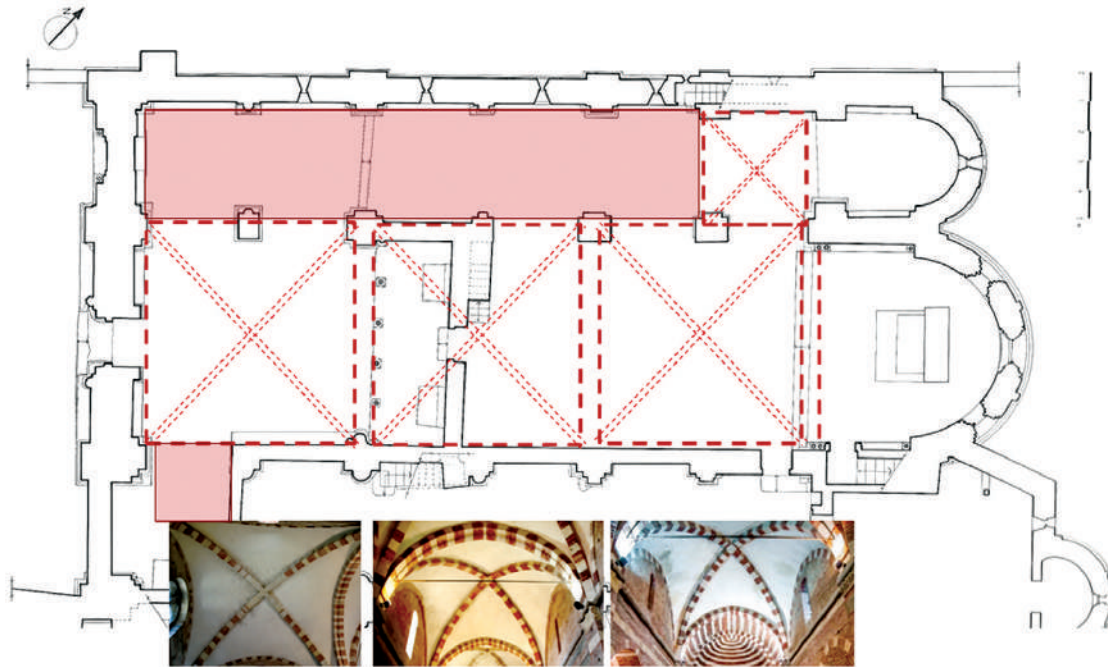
Vezzolano Abbey of Santa Maria. Planimetry with vault types: simple groin vault (full pink hatch), rib vault (dashed vault projection).
